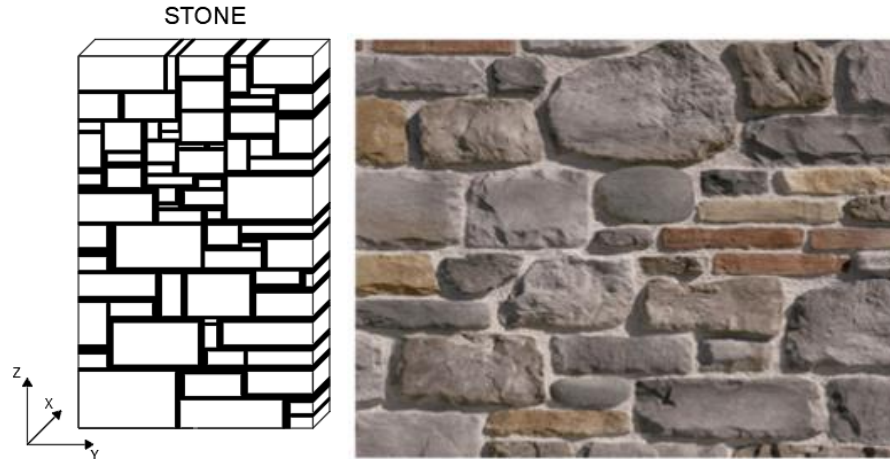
[A] STONE design. [B] Stone masonry example (Schiavi et al., 2019)
